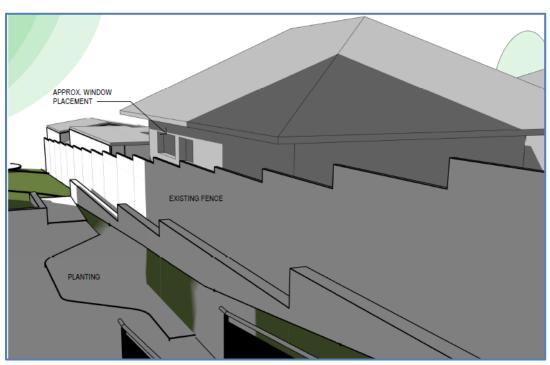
Shadow Elevation Plans 2.30pm on 21 June
